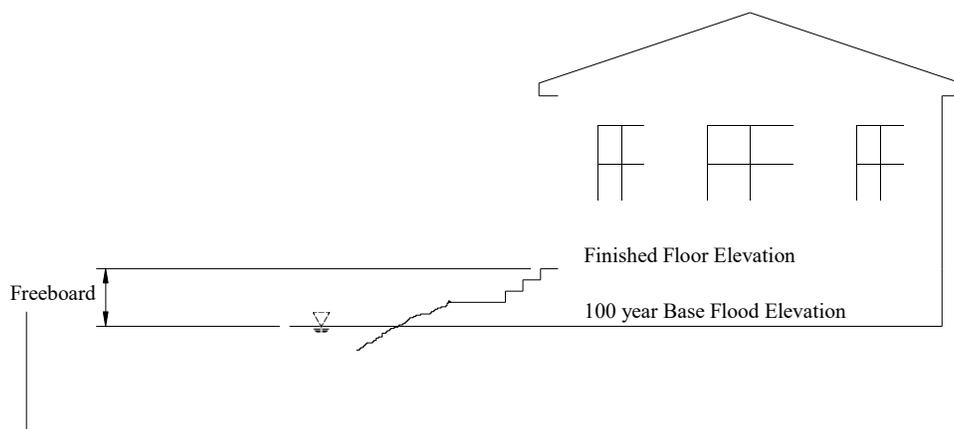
Riverine Area Finished Floor Elevation relative to the Base Flood Elevation.
